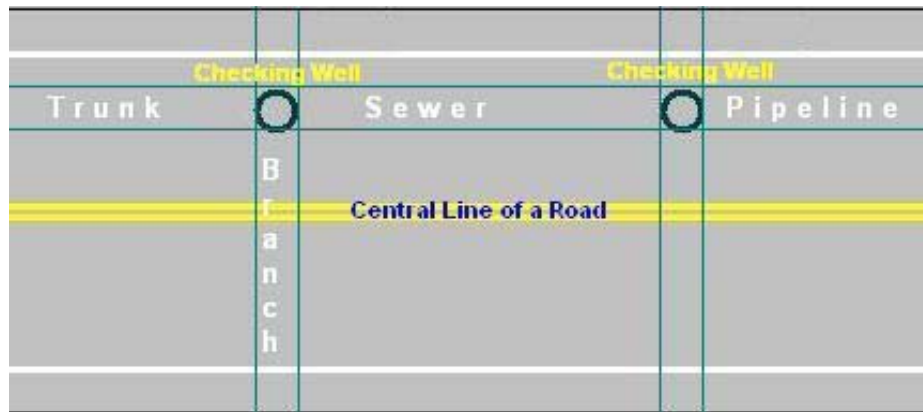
Concept of the layout of Main Trunk and Branch Sewers
